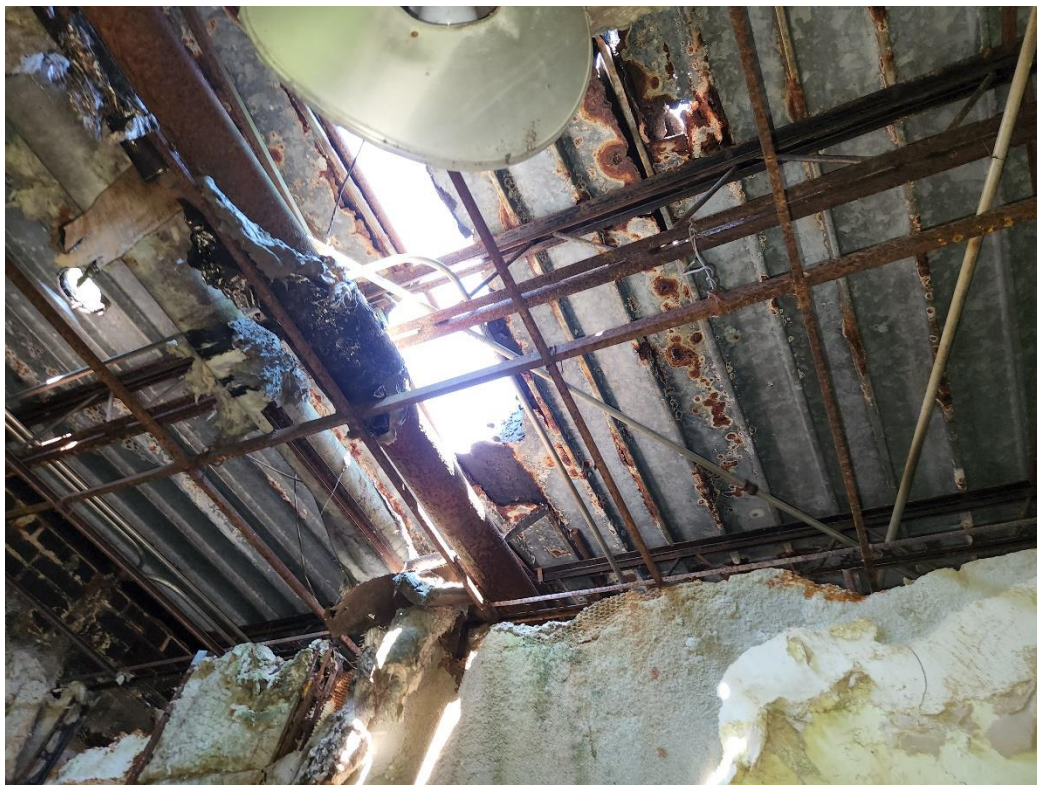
Steel at the exterior walkway is severely deteriorated to the point that it has delaminated.
